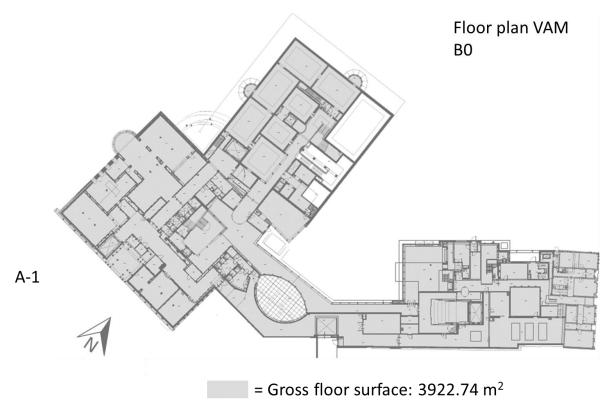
Floor plan A-1 and B0, floor plan under layer by Cahen (2003).
